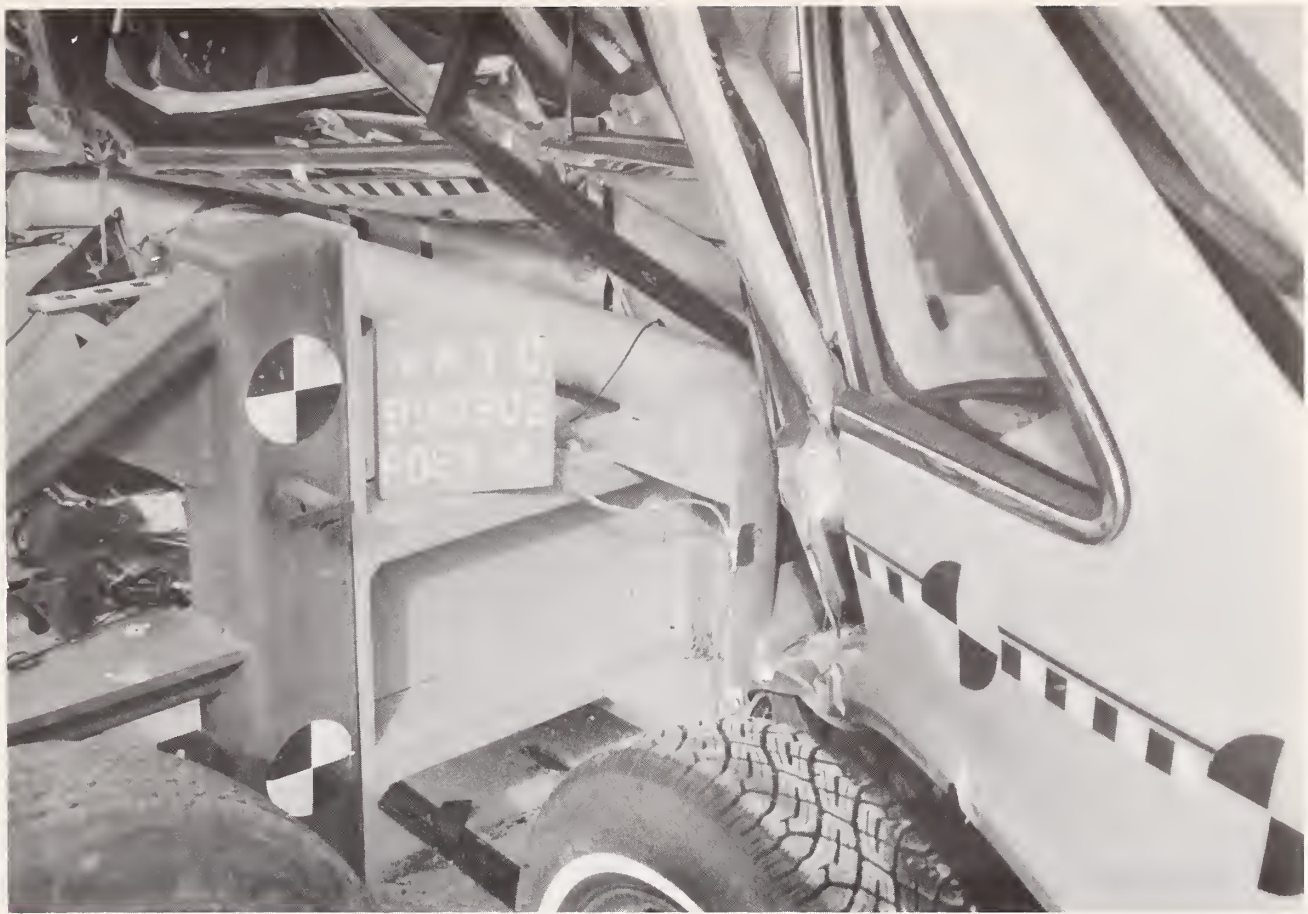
POST-TEST CLOSE-UP LEFT REAR VIEW
